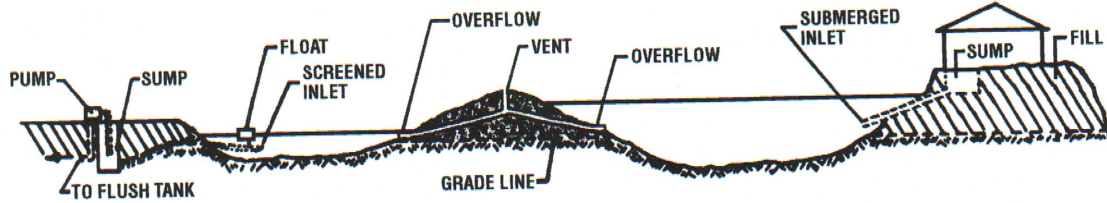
Cut-and-fill construction for two-stage swine waste lagoon system.
